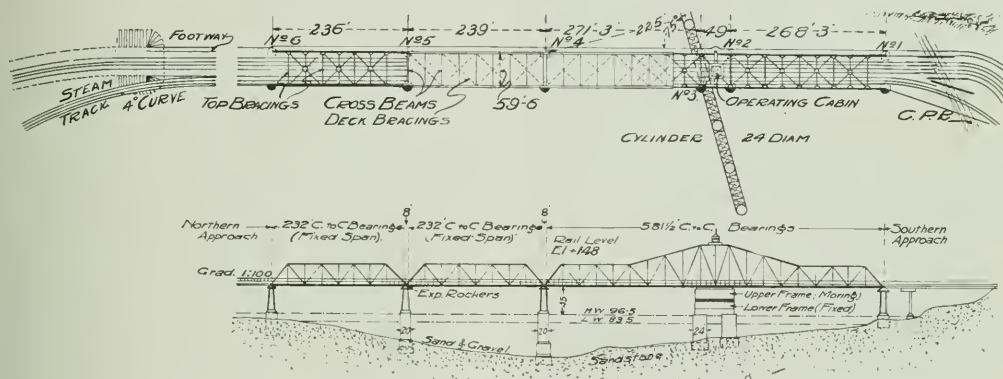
Sketch of Plans for the Second Narrows Bridge, Prepared by Sir John Wolfe-Barry, Lyster & Company, England.
